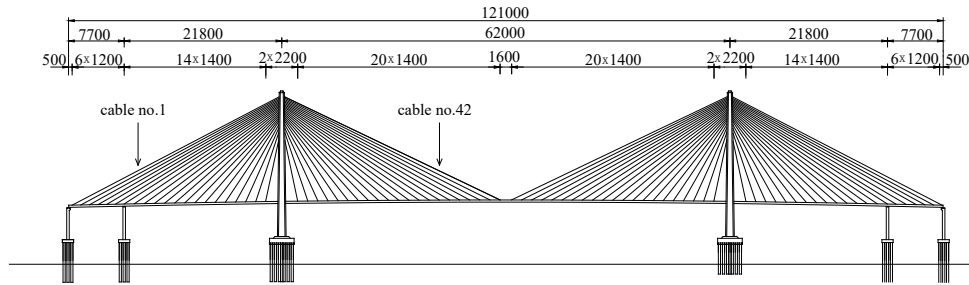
Span arrangement of the cable-stayed bridge (cm)
